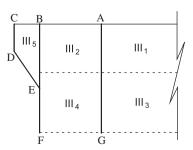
The excavation sequence of layer containing rock-anchored beam.
